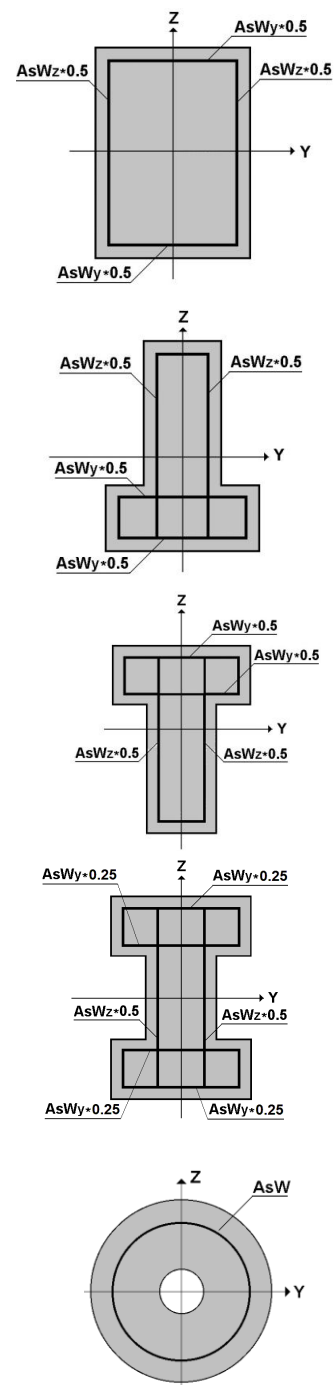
Arrangements of transverse reinforcement at the known areas of transverse reinforcement
